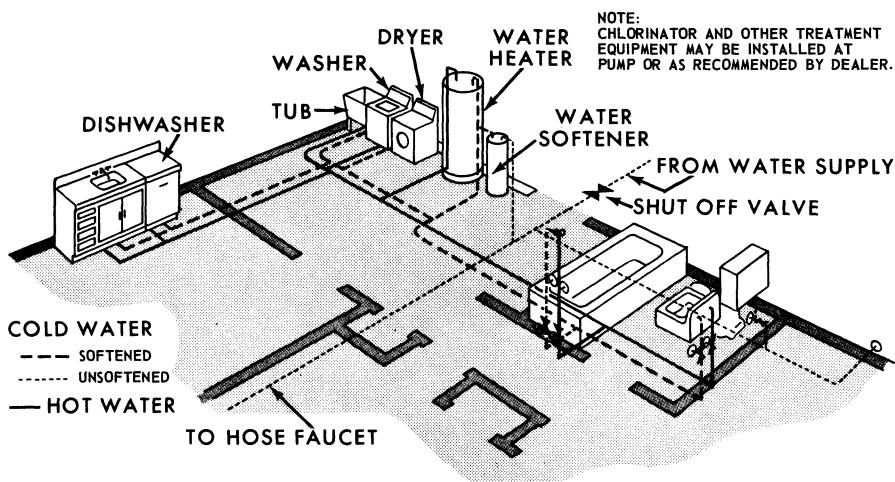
A fixture and water-supply-piping layout for a one-story house.
